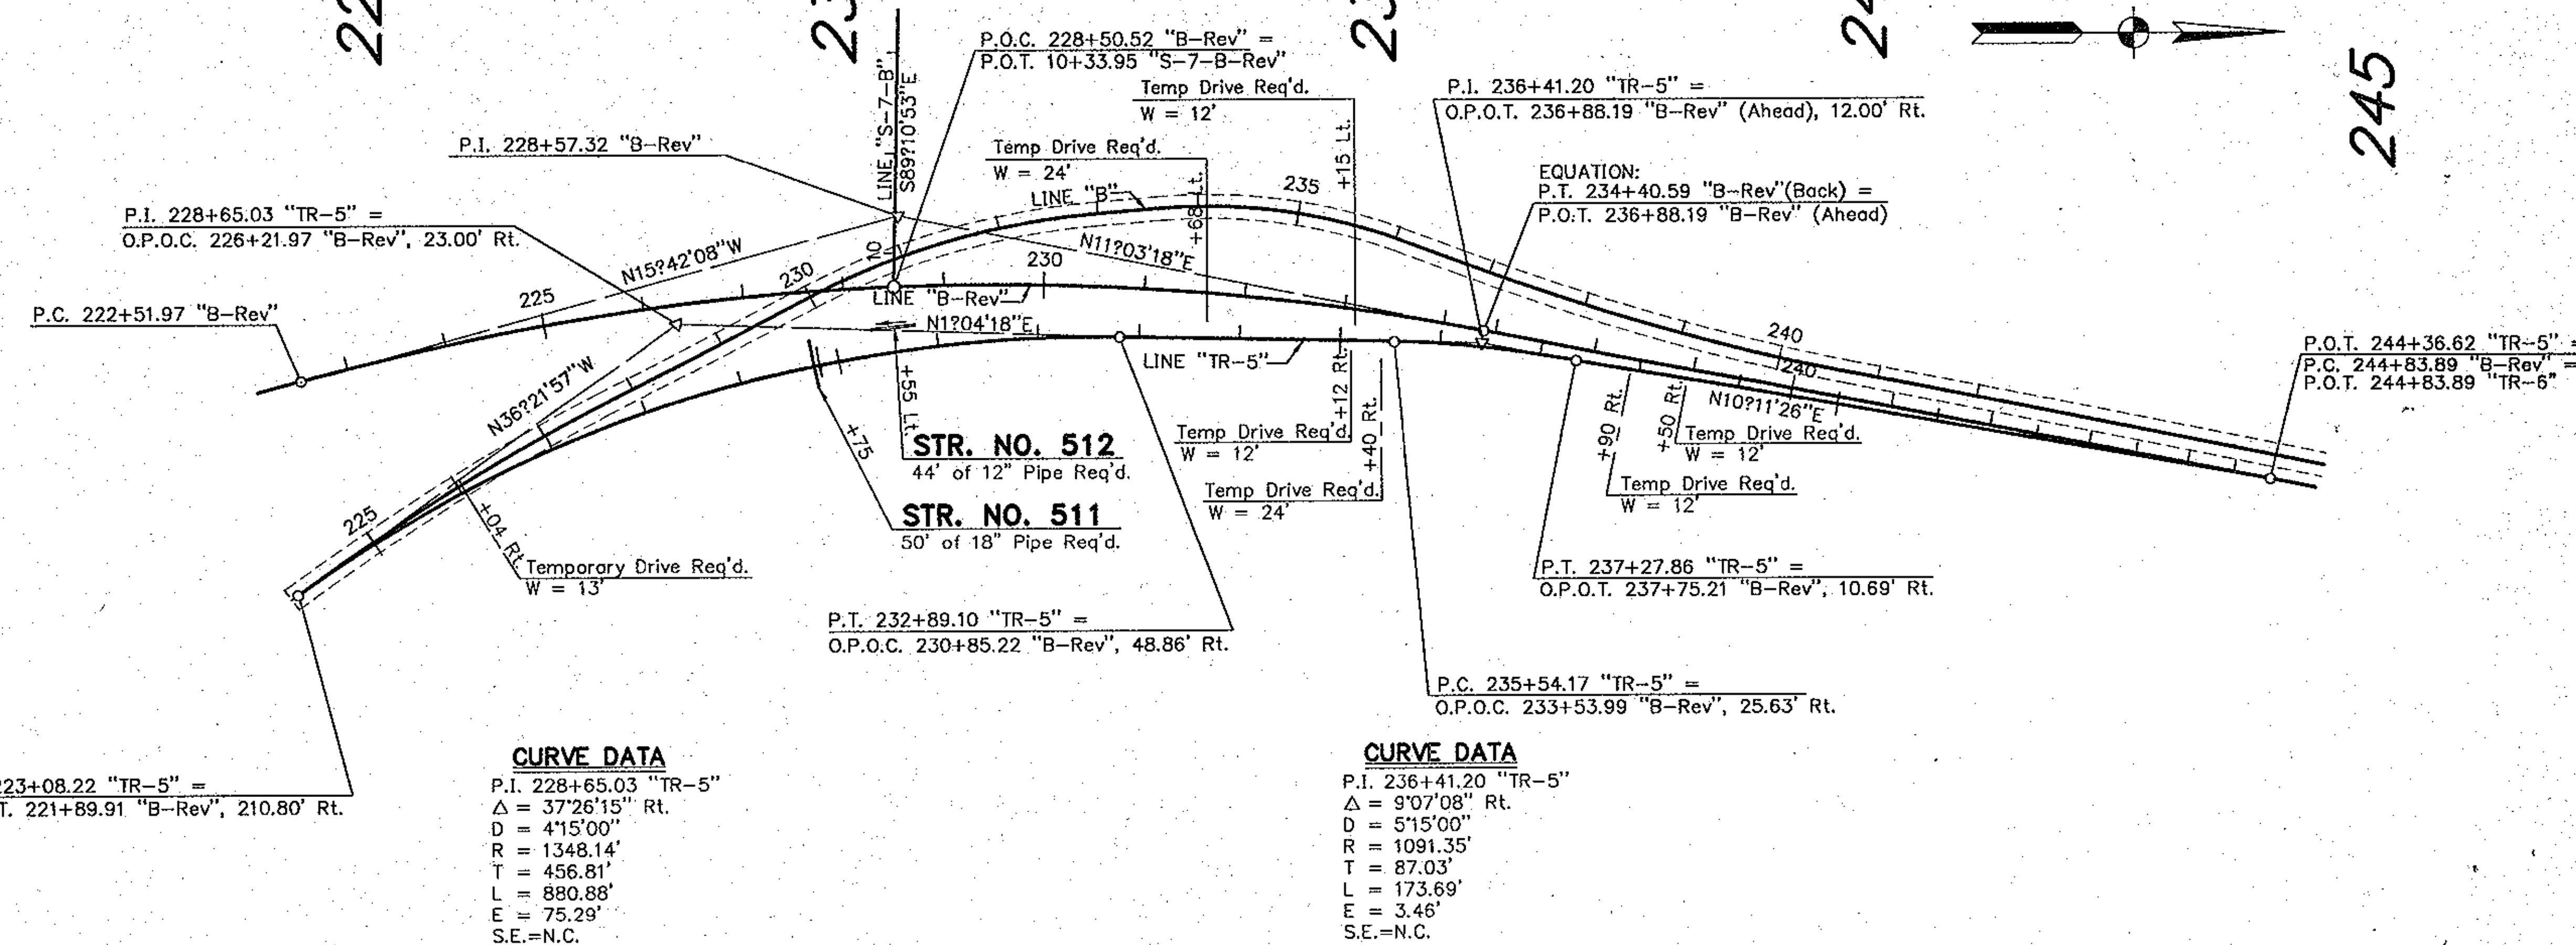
PLAN - PROFILE & R. R. STANDARD 1975
